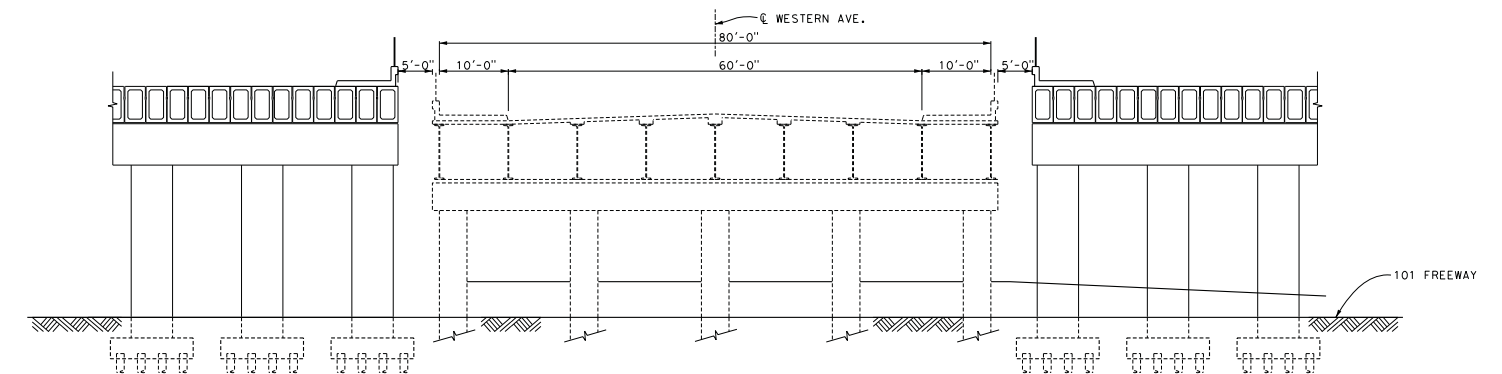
Typical Section Showing Configuration of the New Park Structure and Existing Western Avenue Overcrossing that has a Non-standard Vertical Clearance
